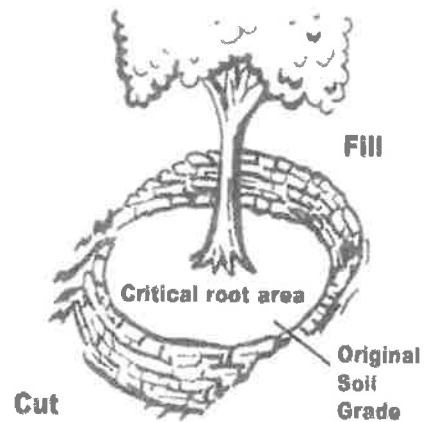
Retaining walls can keep original soil grade within the critical root area and allow deep cuts and/or fills to achieve the grade changes needed for construction
